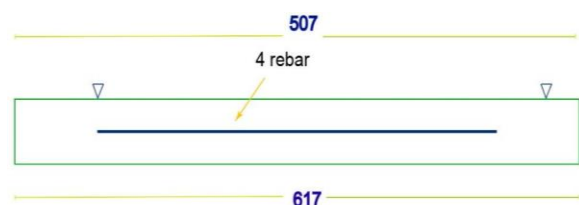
Reinforcement ultra high performance concrete within test slabs (mm)
